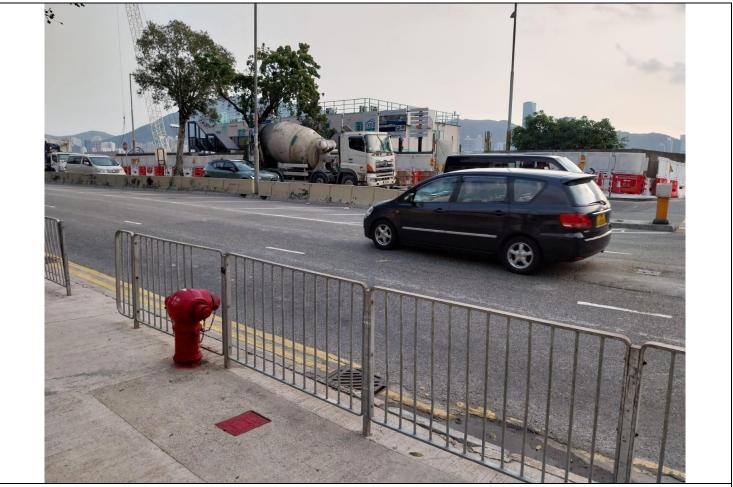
Road condition along Cha Kwo Ling Road next to station AM4(B) (Taken on 02 Mar 2023)
